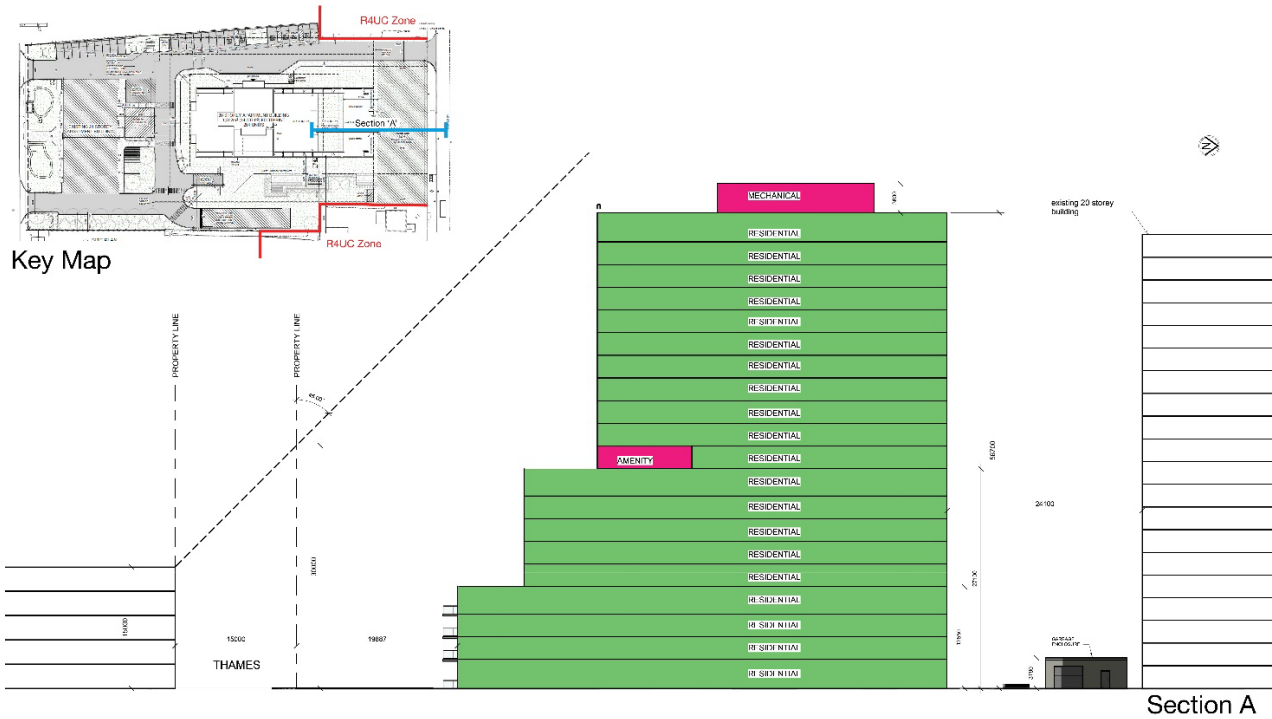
Angular Plane Diagram from Thames Street (Section 'A')
